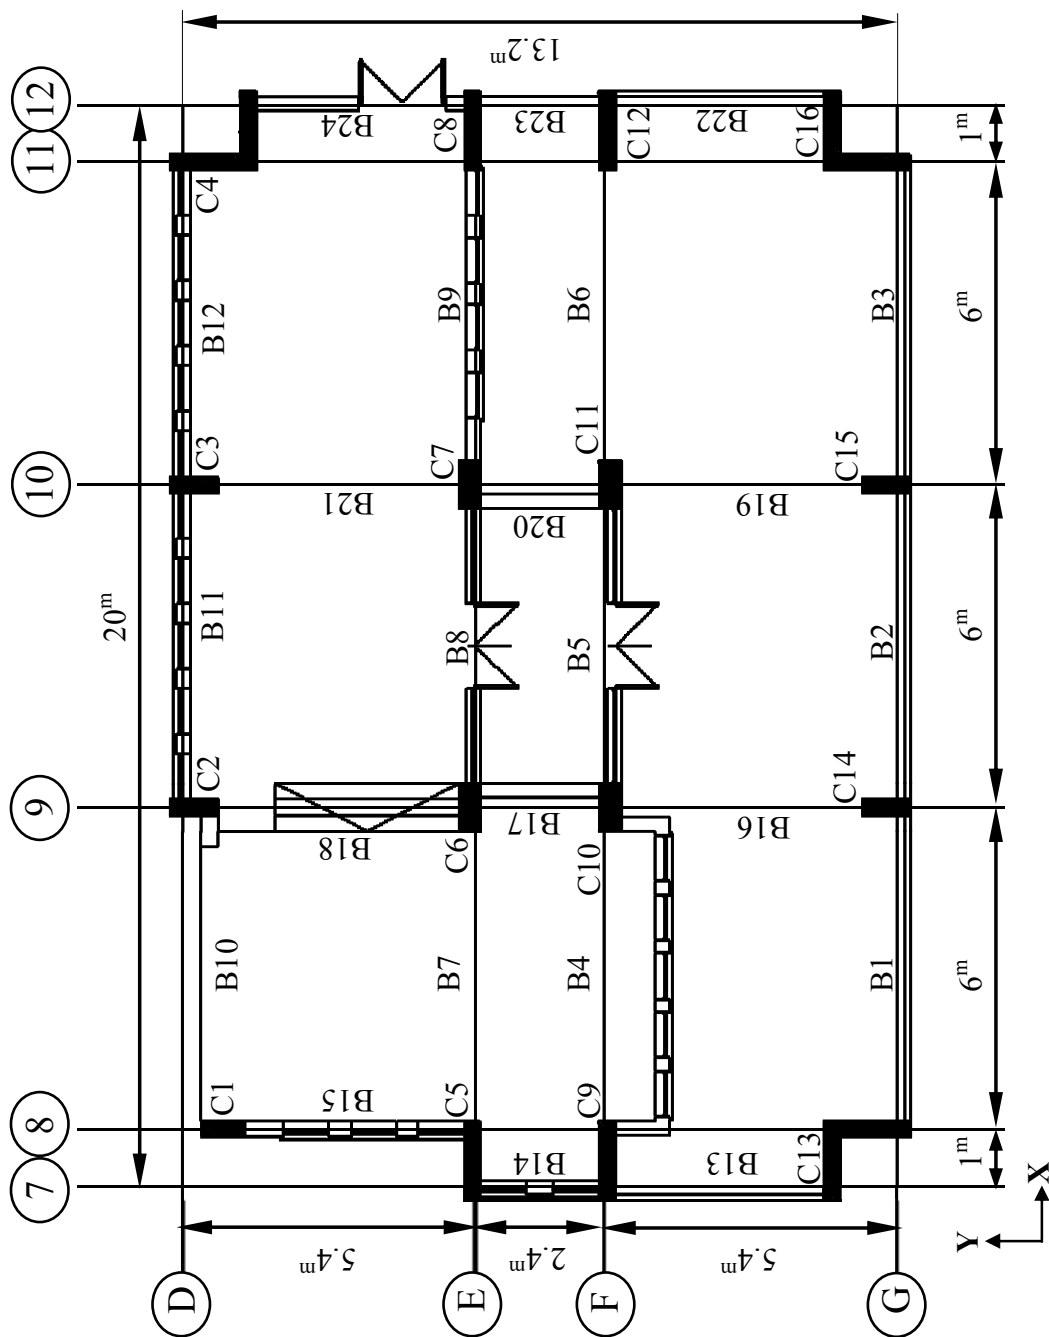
Typical floor plan of the MPWR building (adapted from Çağnan, 2001)
